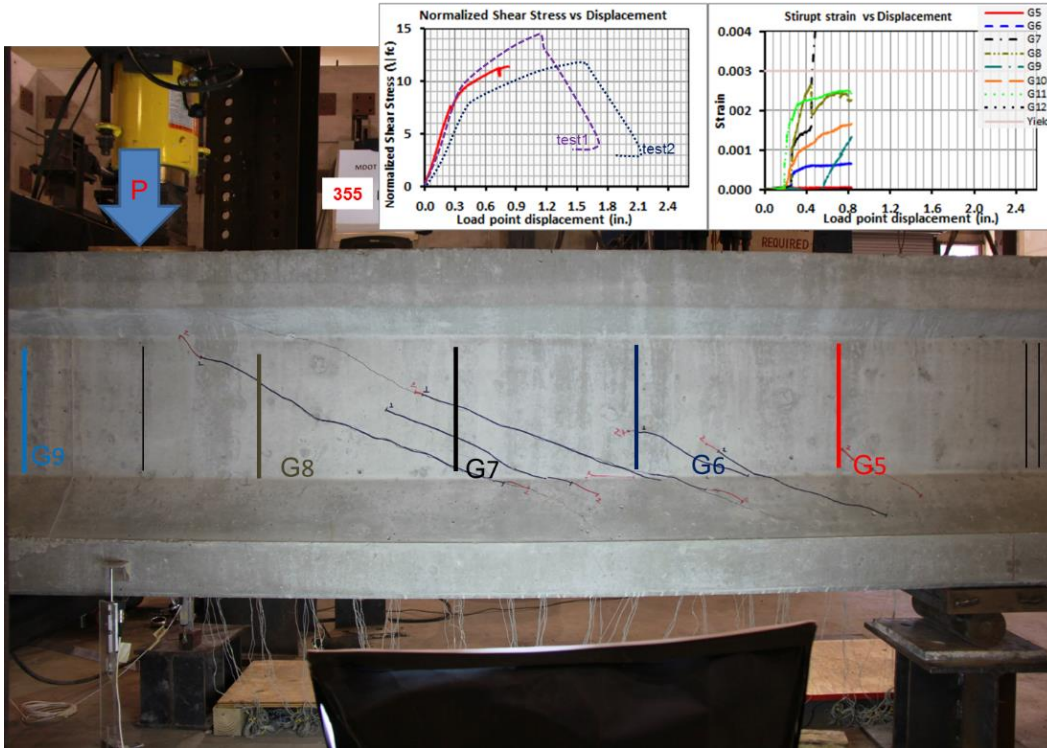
Girder 1-Test 3 peak load prior to failure
